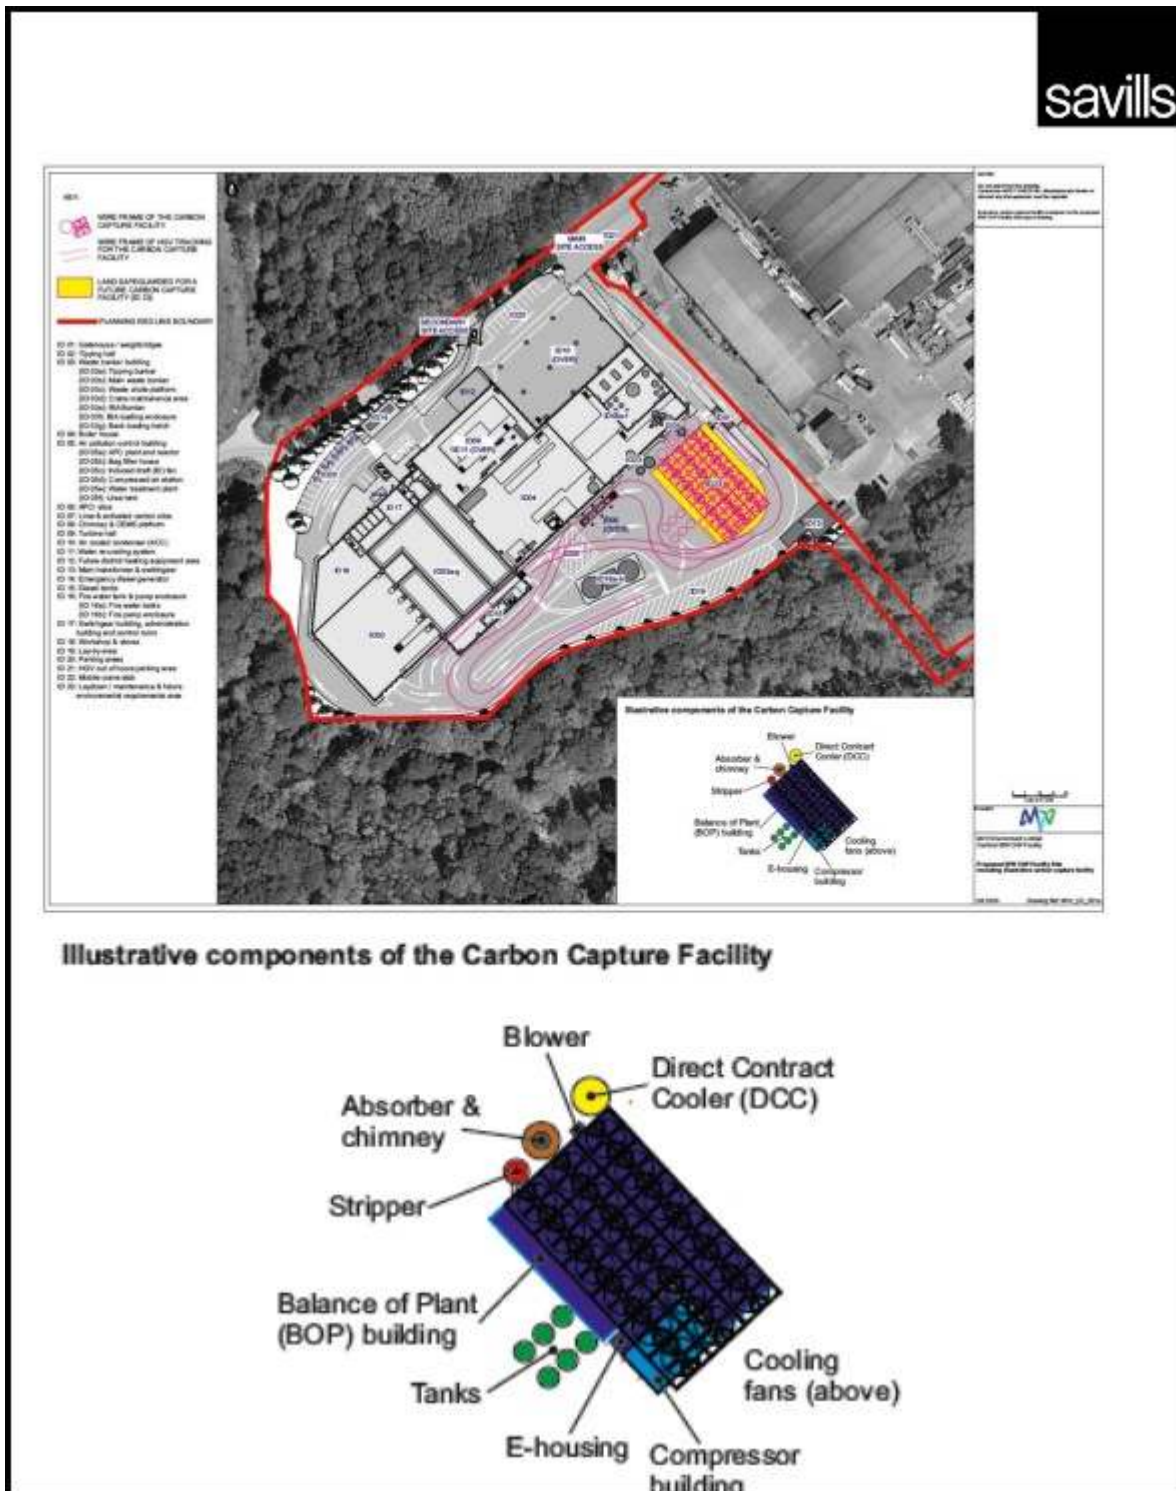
Kanadevia's outline plan for a Carbon Capture facility at the Canford site
